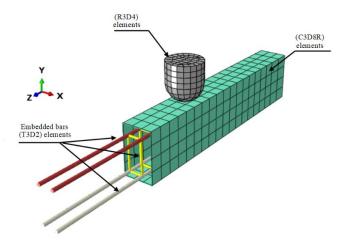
Details of the finite element mesh utilized for concrete beam modeling
